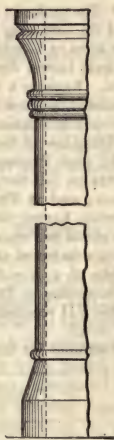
Cast-iron Column with Cap and Base. Slight Projections
